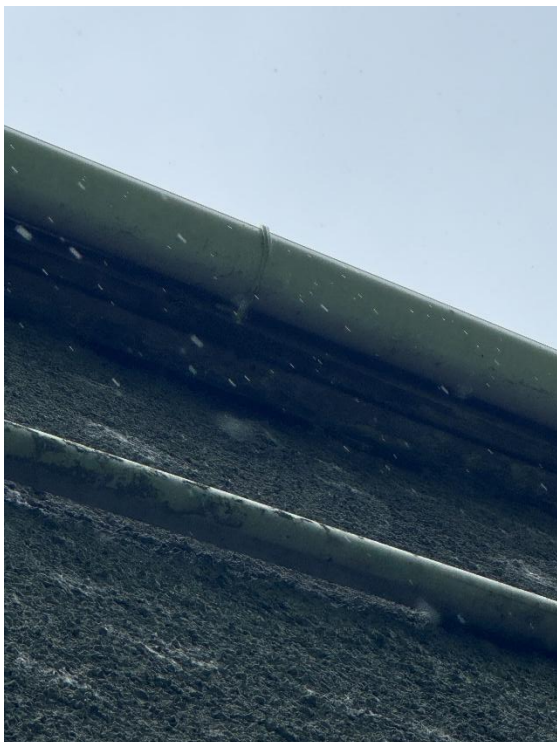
Possible gaps between soffit and wall on eastern aspect of building B.
